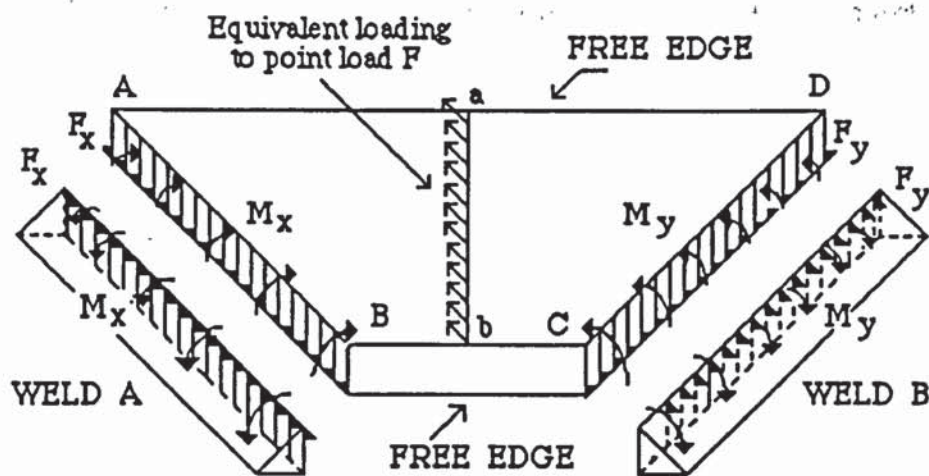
Assumed equivalent loading of temporary end plate connection.
